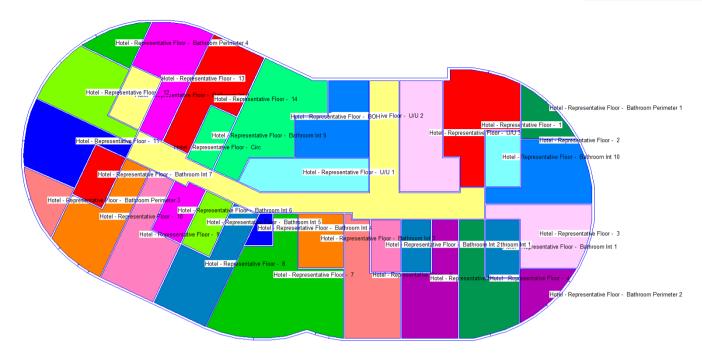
Typical Hotel Floor - HVAC Zoning
